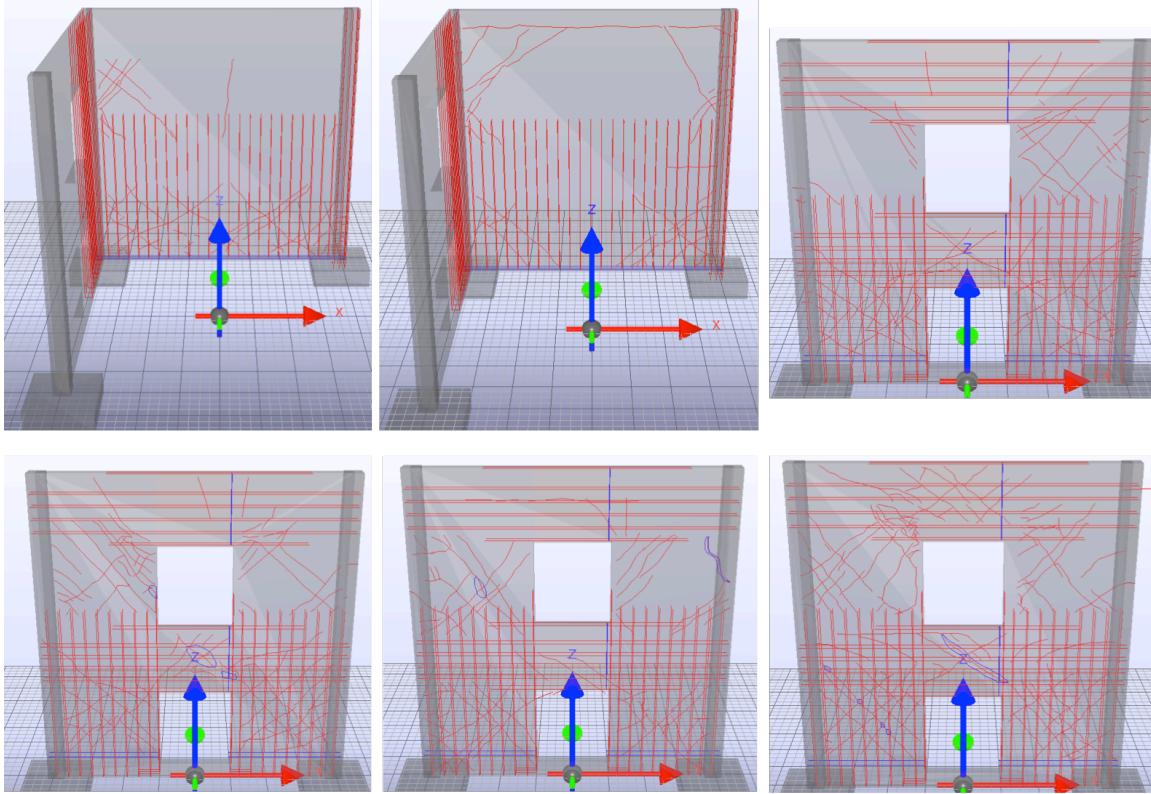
In total 18 wall elements, which contain 42 piers and spandrels were assessed visually and by performing strength analyses. Six of the elements containing various crack patterns and spalling are shown. Reinforcing bars, which were used for calculating the strengths are also shown.
